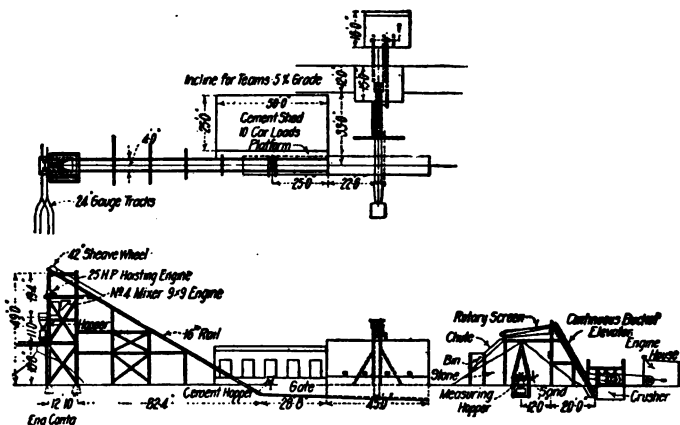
Plan of Screening, Crushing and Mixing Plant, Springfield Filters.
